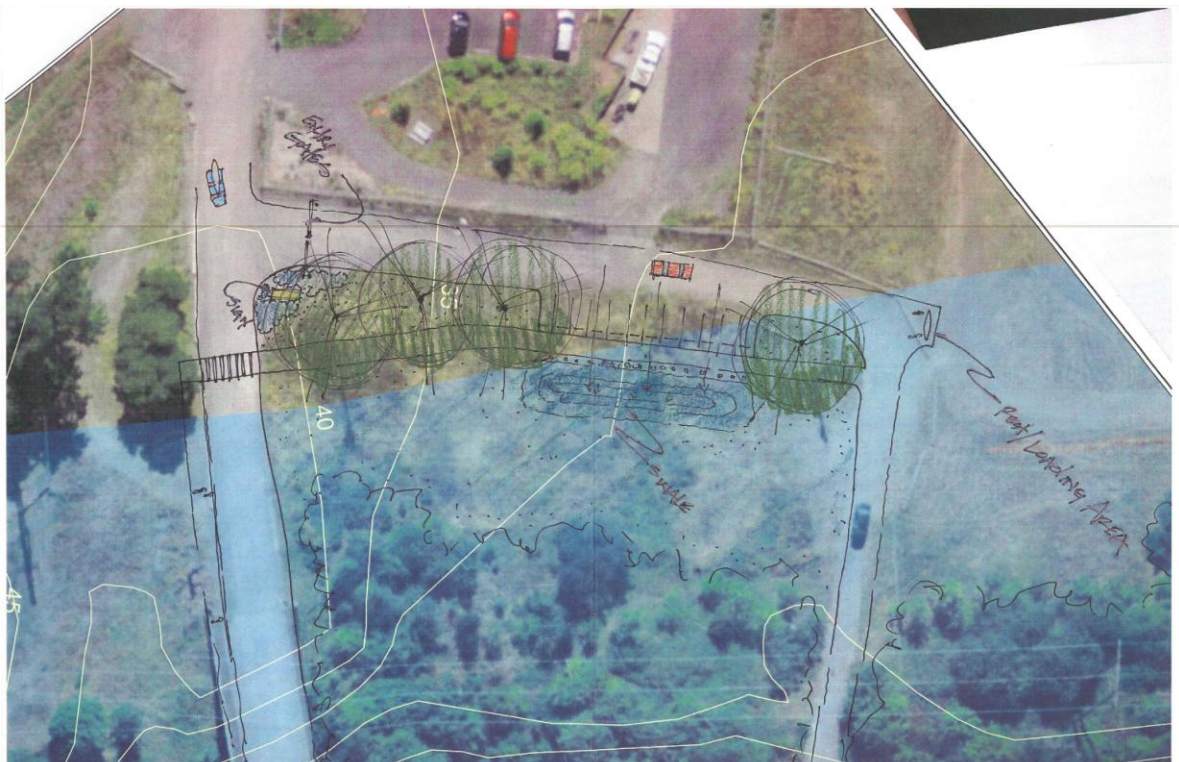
Sketch of proposed trailhead adjacent to existing St. Johns landfill bridge
